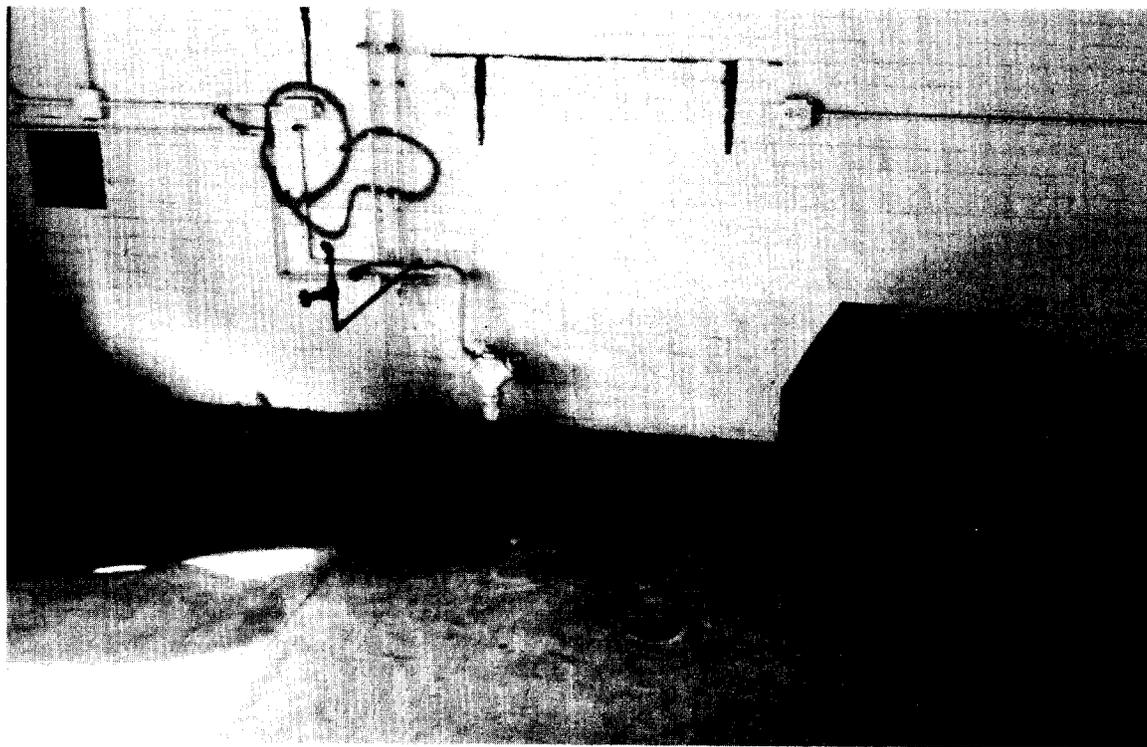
Contaminated area near fixtures on north wall in Room 2.
